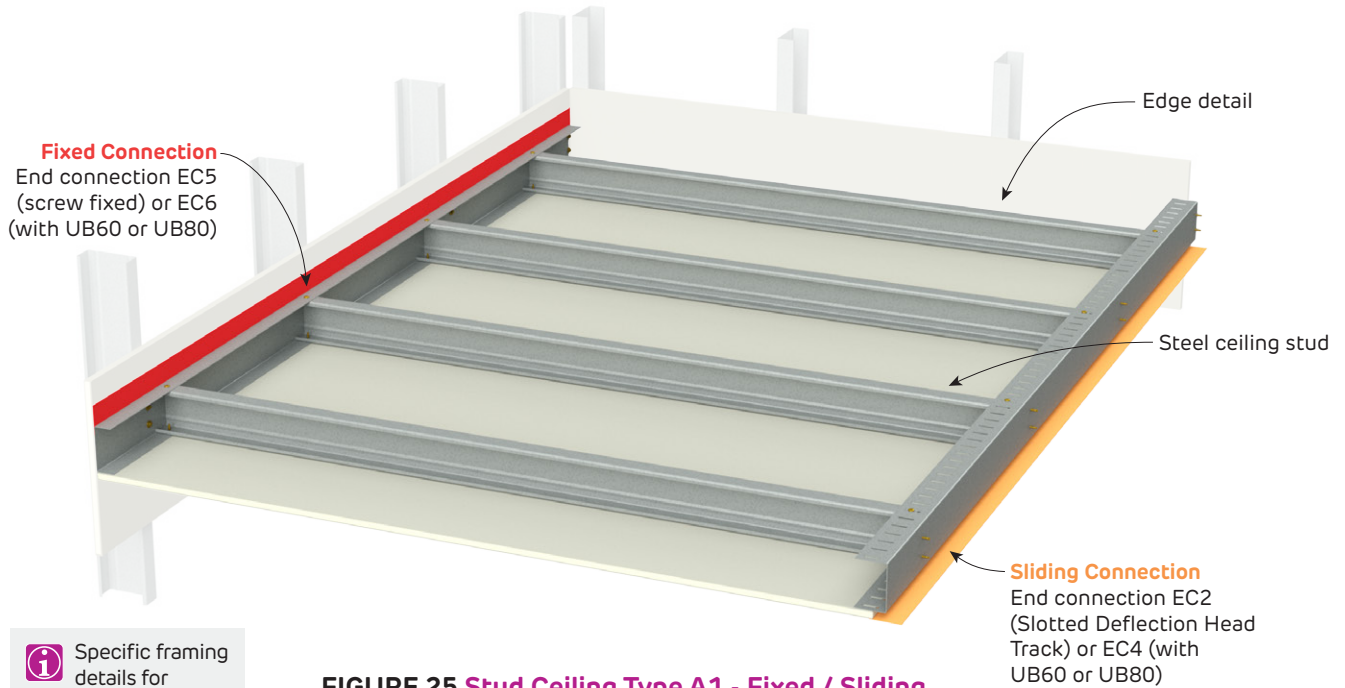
Stud Ceiling Type A1 - Fixed / Sliding
